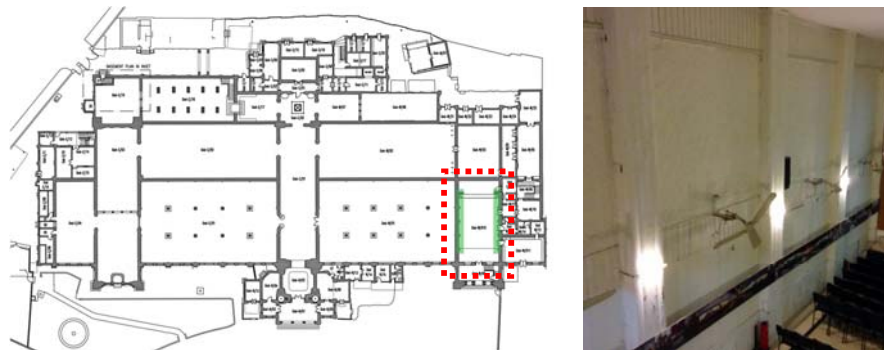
Lahore Museum key plan showing location of Brick Masonry Columns In Space Gnd-W/10 (left) Looking East Brick Columns in Space Gnd-W/10 (right)
